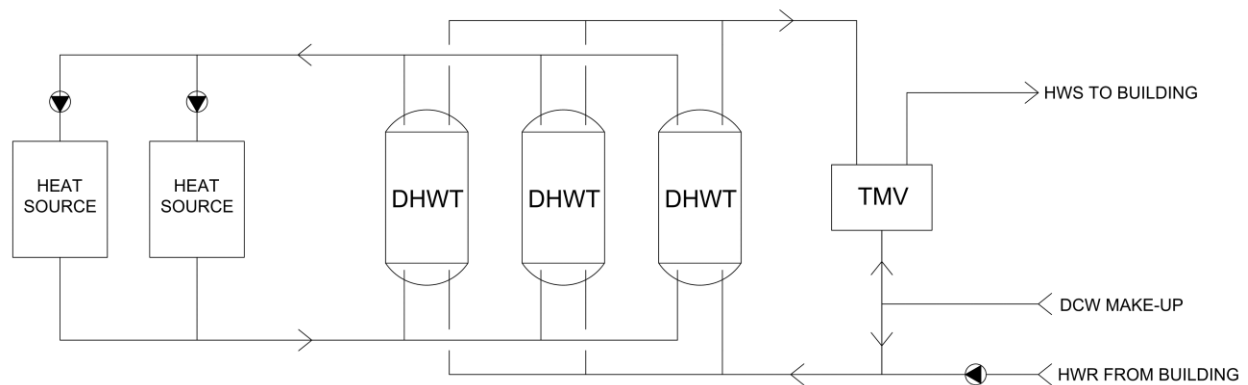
Typical Multi-Unit Residential Building Domestic Hot Water System Layout
